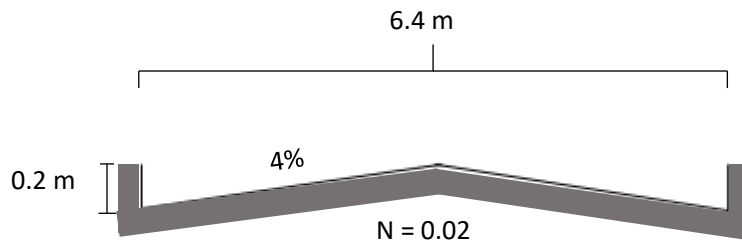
road cross section based on geometric design guidelines, used as conduit design in SWMM.
